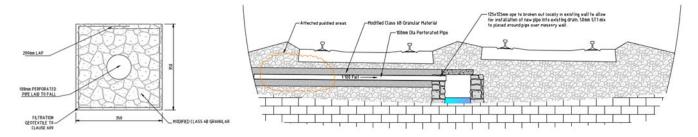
Typical section on Phoenix Park Tunnel showing existing drainage. Source: Phoenix Park Tunnel, drawing SDS-15-152-P03-023
